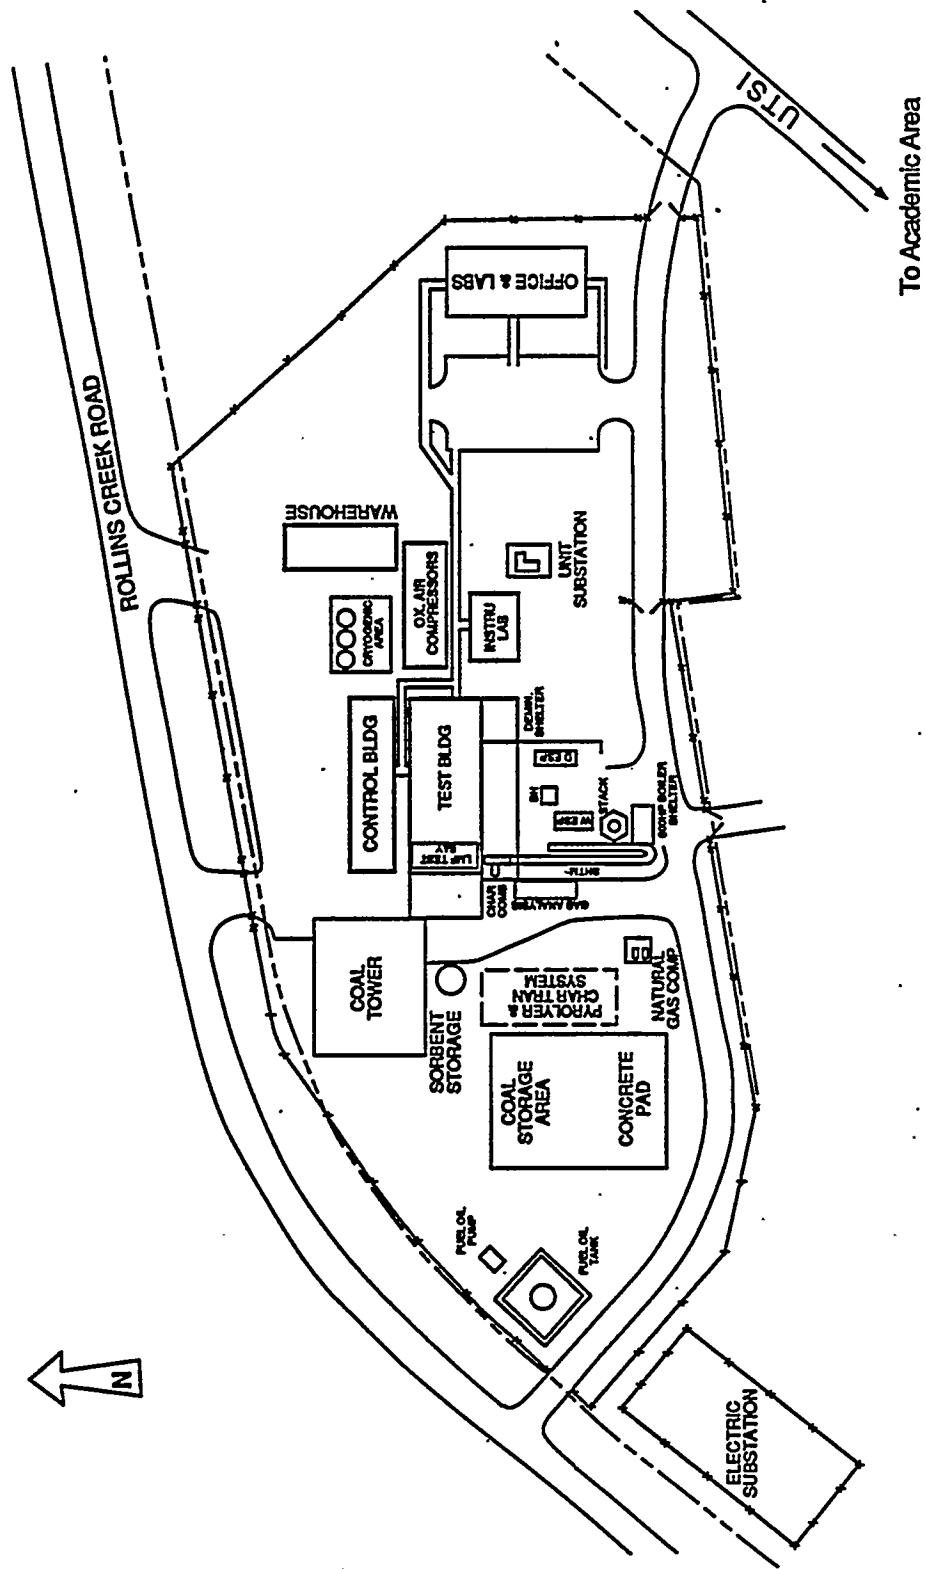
Layout of the UTSI Facility — CFFF Site Plan
